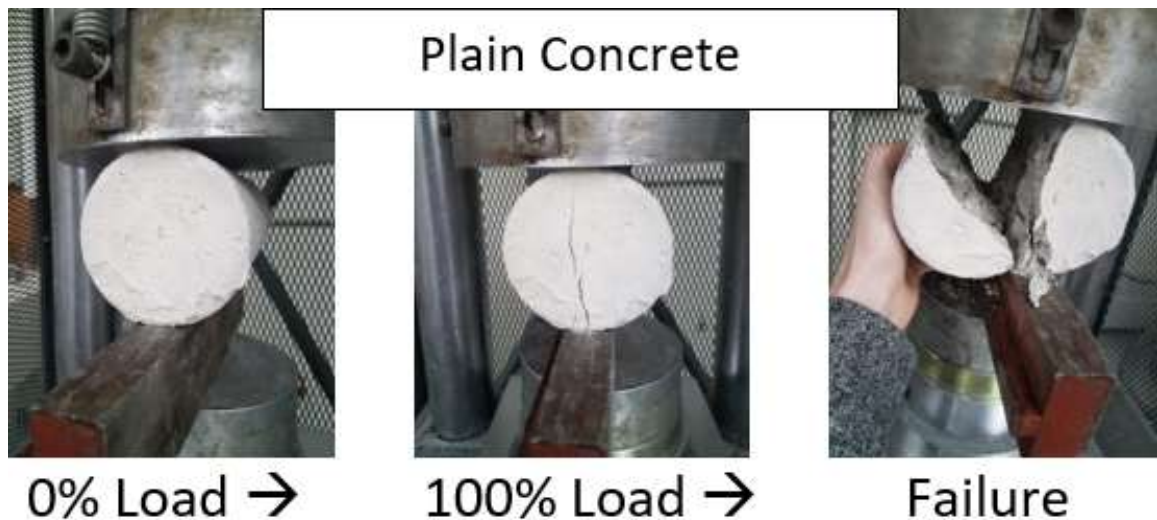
Plain Concrete Tensile Failure Mechanism
